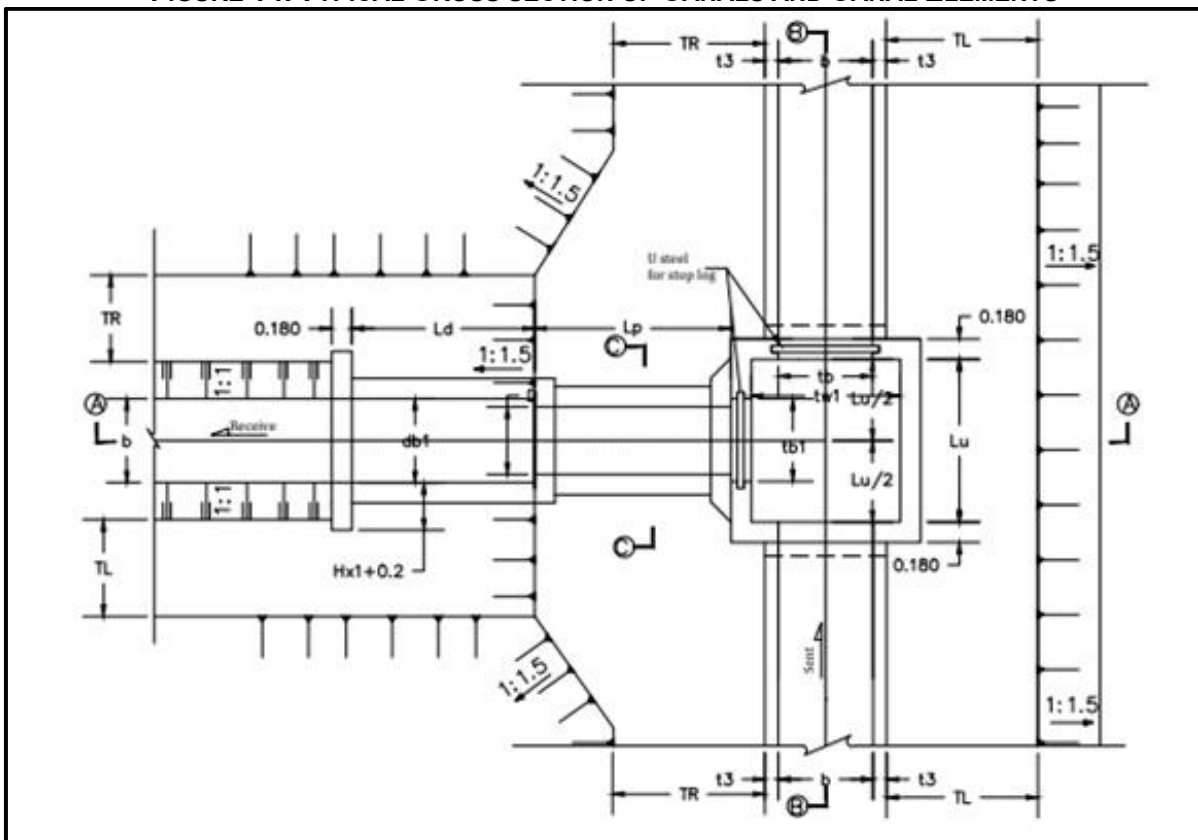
TYPICAL CROSS SECTION OF CANALS AND CANAL ELEMENTS
